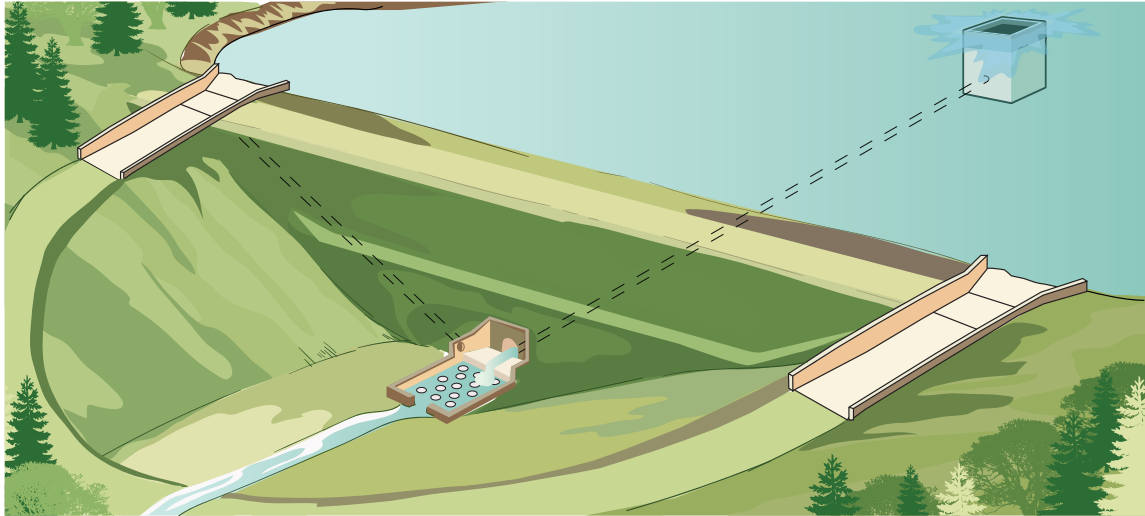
To increase spillway capacity, widen an existing spillway or build a second spillway.
